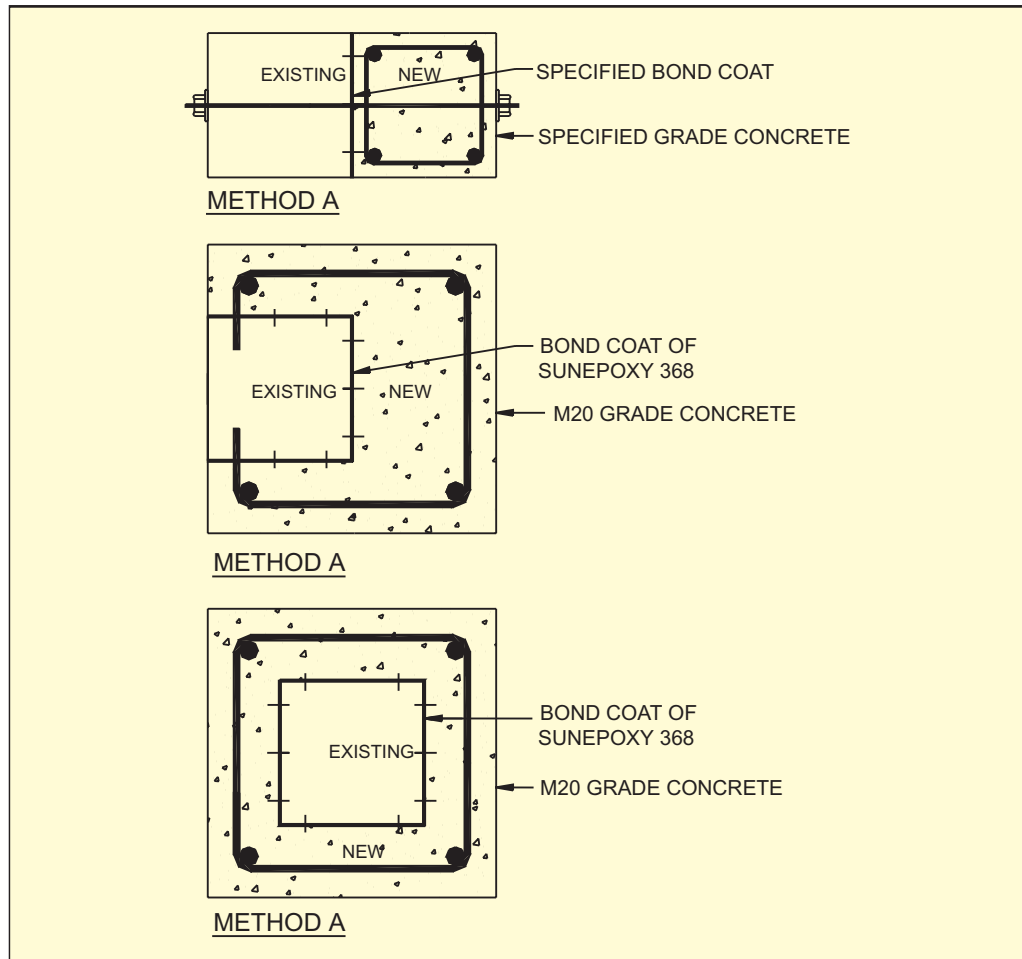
Column Compressive Strengthening by Section Enlargement
